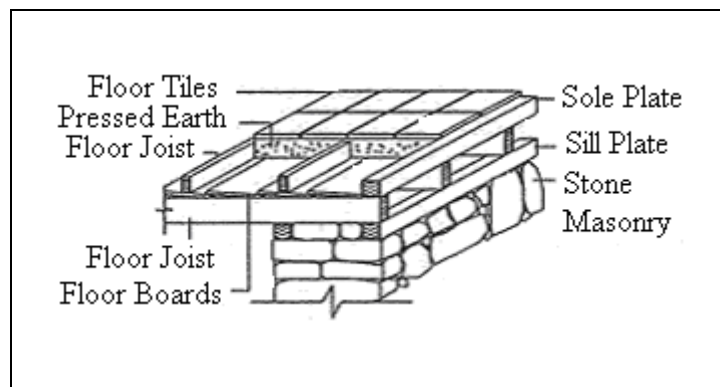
Double Layered Floor Type (Köysüren, 2002:67)
